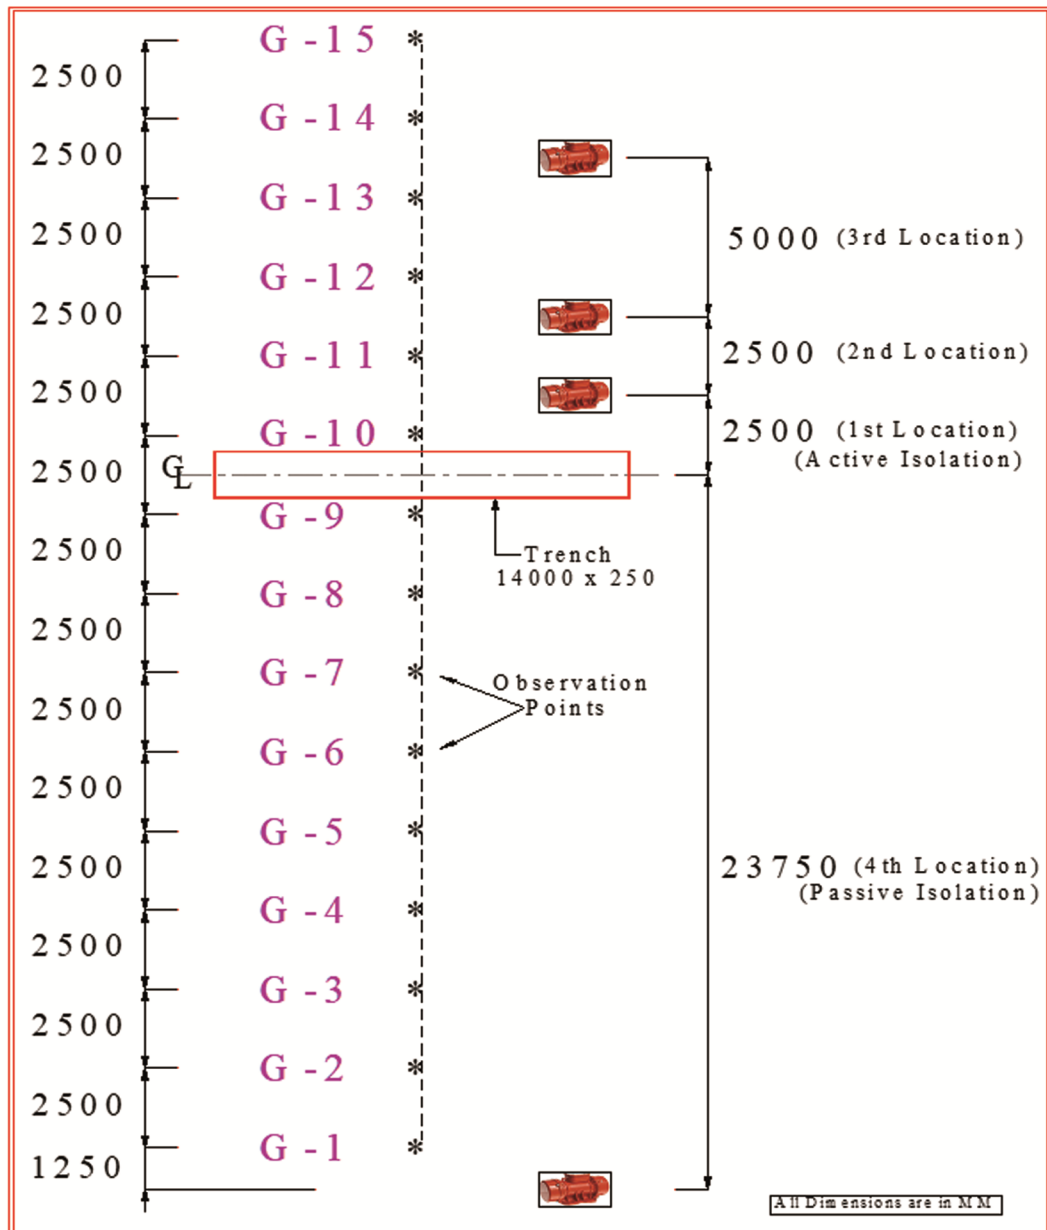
Layout and instrumentation detail showing locations of source of vibration and observation points.
